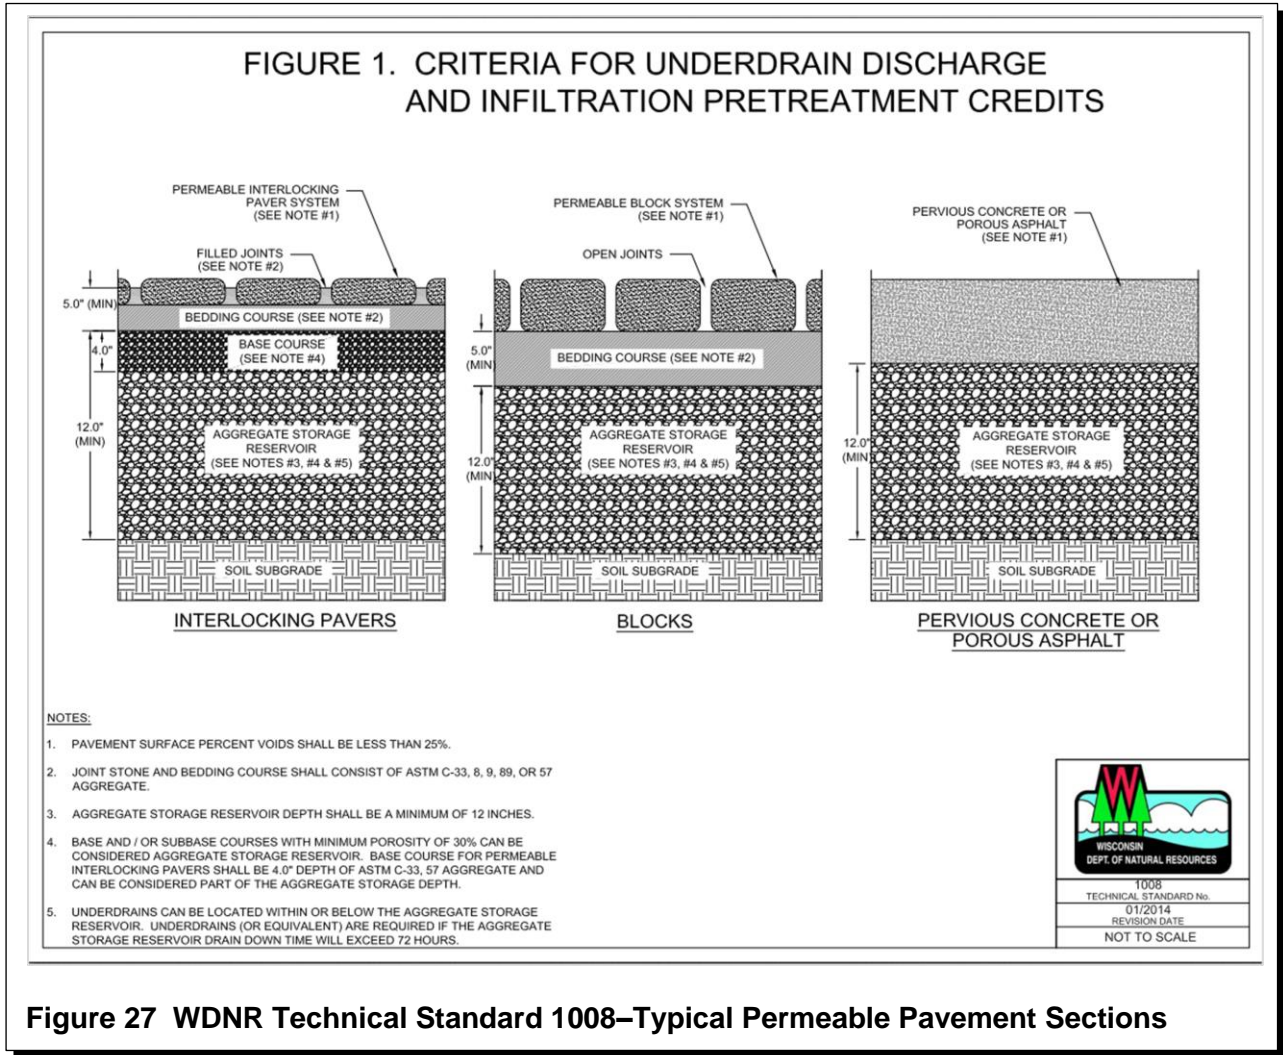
WDNR Technical Standard 1008–Typical Permeable Pavement Sections
